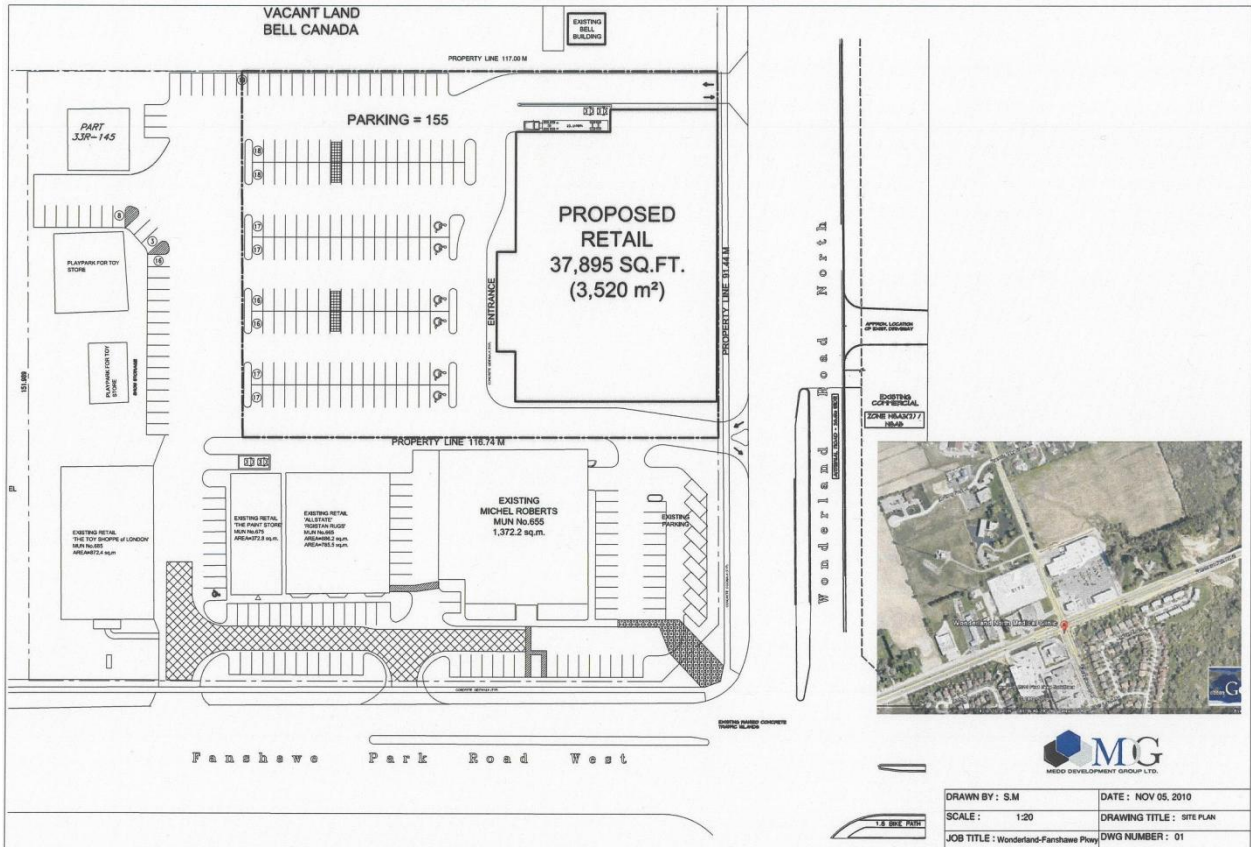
Conceptual site plan submitted by the applicant in 2010 illustrates full access to the site at the northern driveway
